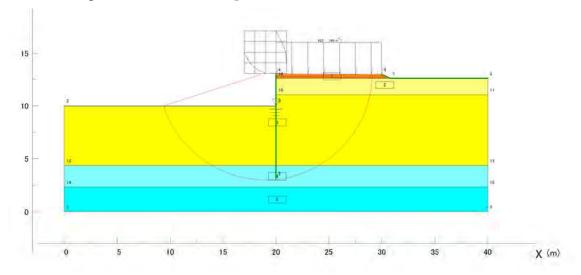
Model of Circular Slip in case of Steel Sheet Pile
